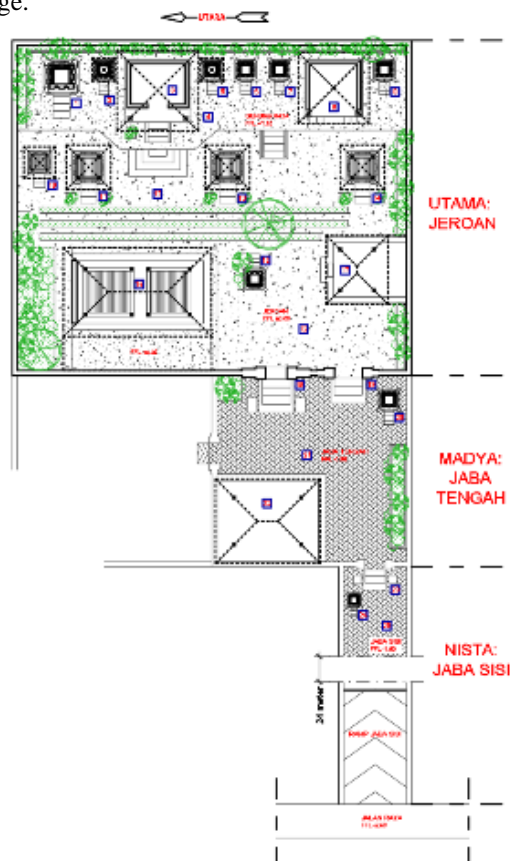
Mertasari Temple Layout Plan, Source: Author, 2022
